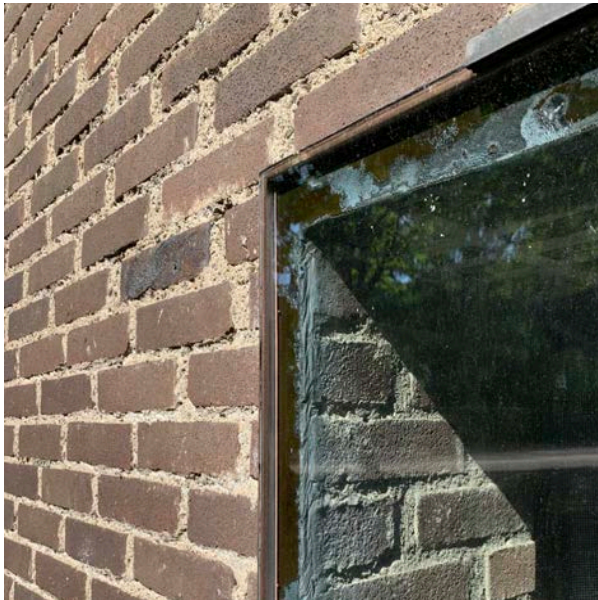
Sigurd Lewerentz, window detail, St. Peter's Church in Klippan, 1963-66
